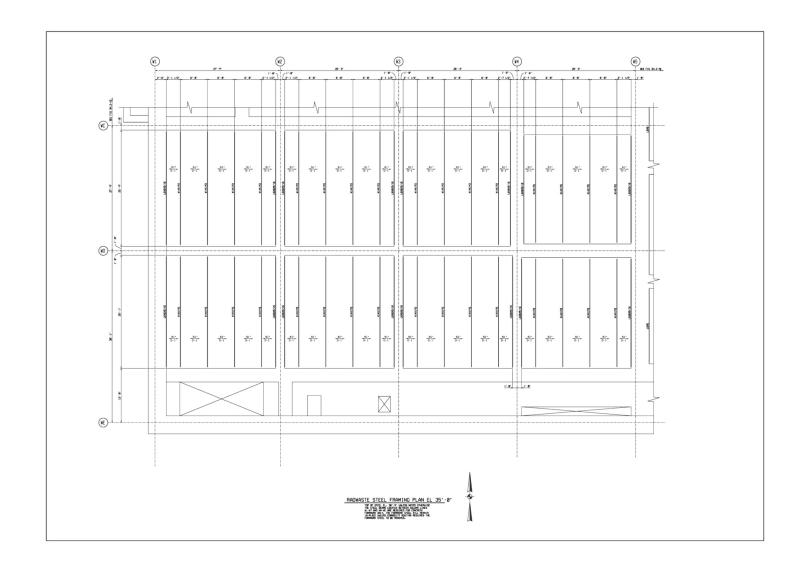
H.3-45 El 35'-0" Steel Layout Between Column Lines W1-W5 and WC-WE
